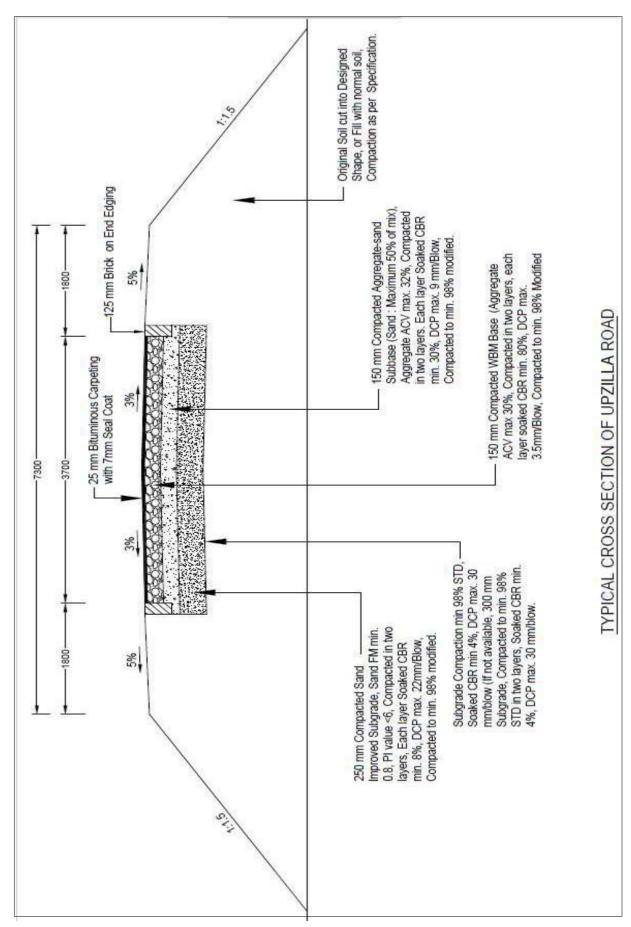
Typical Cross Section of Upazila Road (LGED, 2005)
